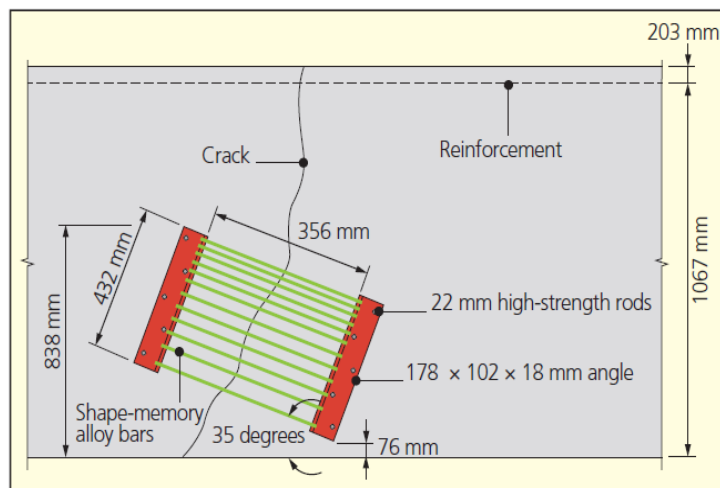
Fe-SMA rods crossing the cracks [50]
